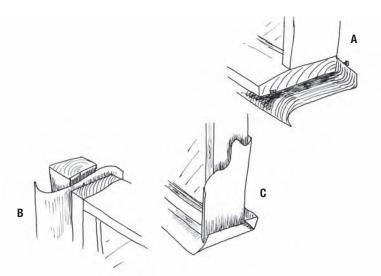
A side flashing for a timber window. Note that the sill flashing is to envelope the side flashing at their junction
